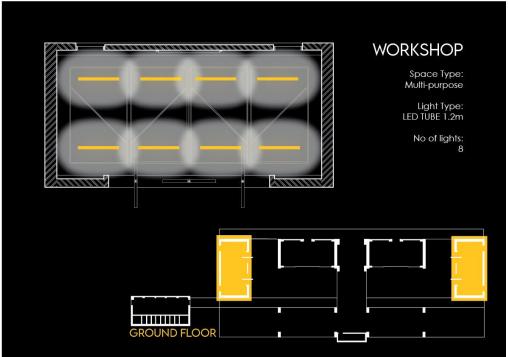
Lighting: Illustrated plan of lighting for the Workshop, (Author, 2021)
